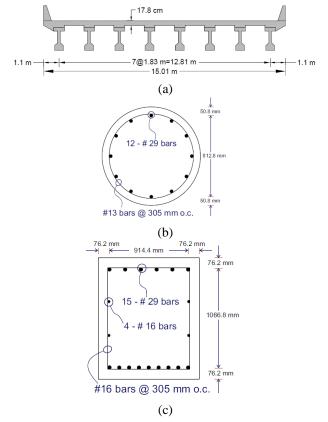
The scheme of deck (a) Column section (b) and Cap beam section (c) (Nielson 2005)
